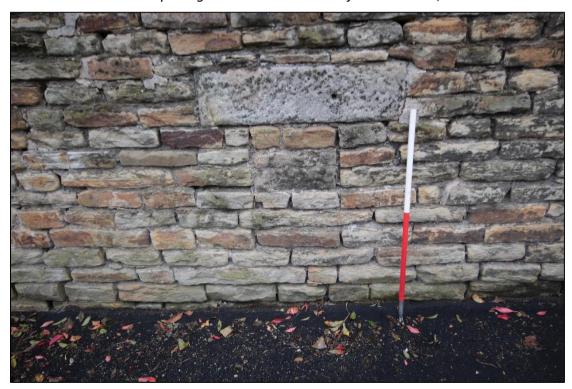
Blocked opening with lintel on the east elevation of the farmyard complex of buildings, with 1m scale.
